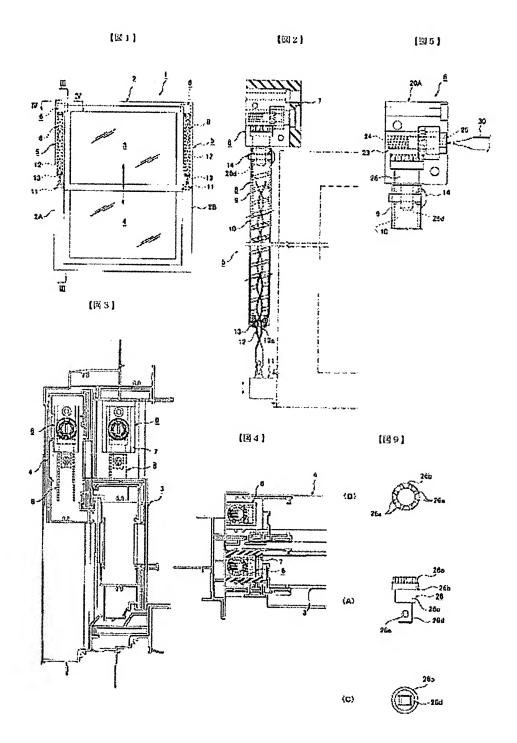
This shows the vertical gear component 26. (A) is a side view, (B) is a plane view and (C) is a bottom view.
